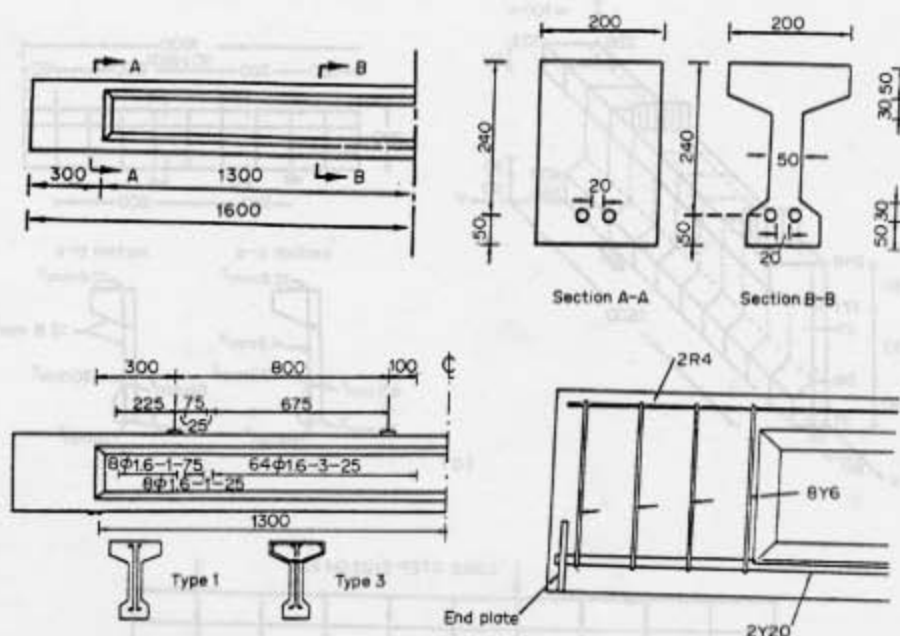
Under-reinforced T-beam used for economic-modelling purposes (beam C [8]). Dimensions and reinforcement detailing.
